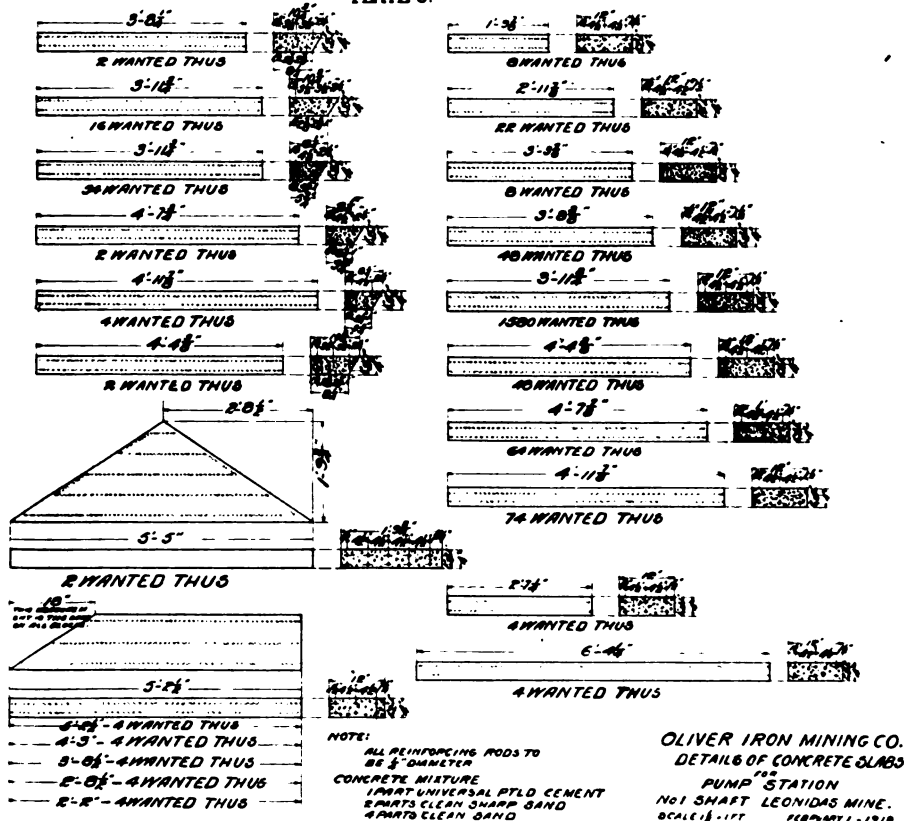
Construction and Arrangement of Pump Station, 437 ft. Level. No. 1 Shaft
